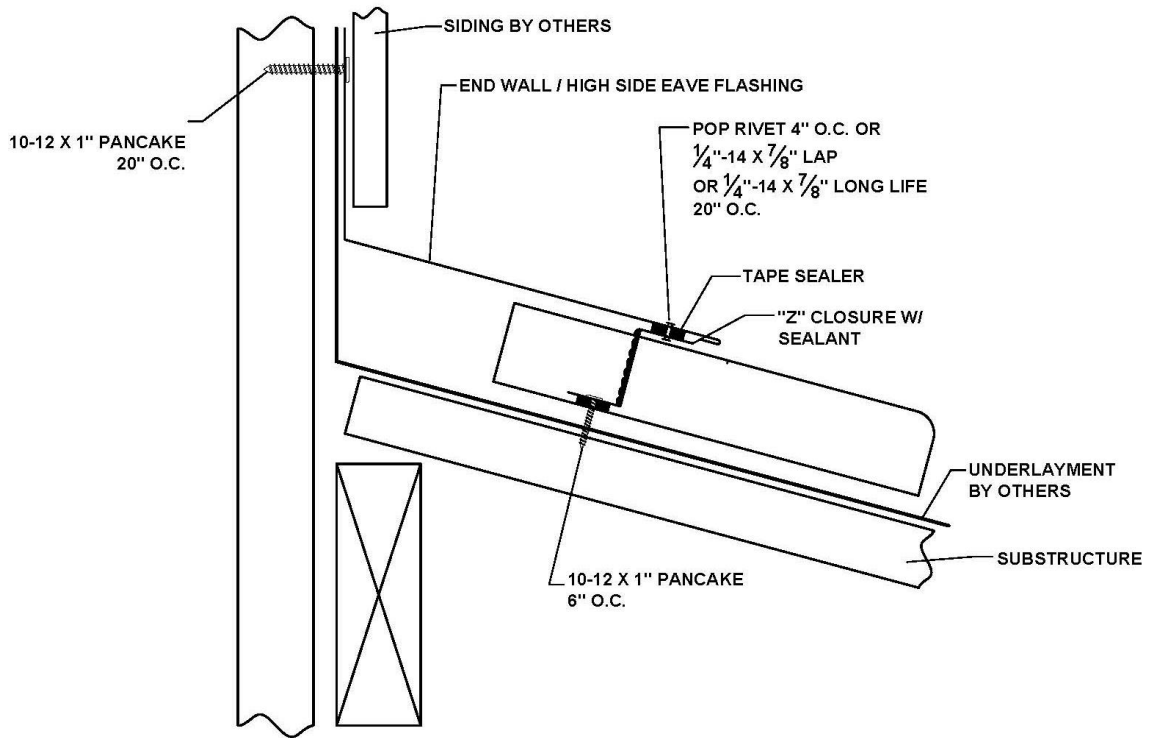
Fixed Endwall/Parapet High Side Eave Detail
